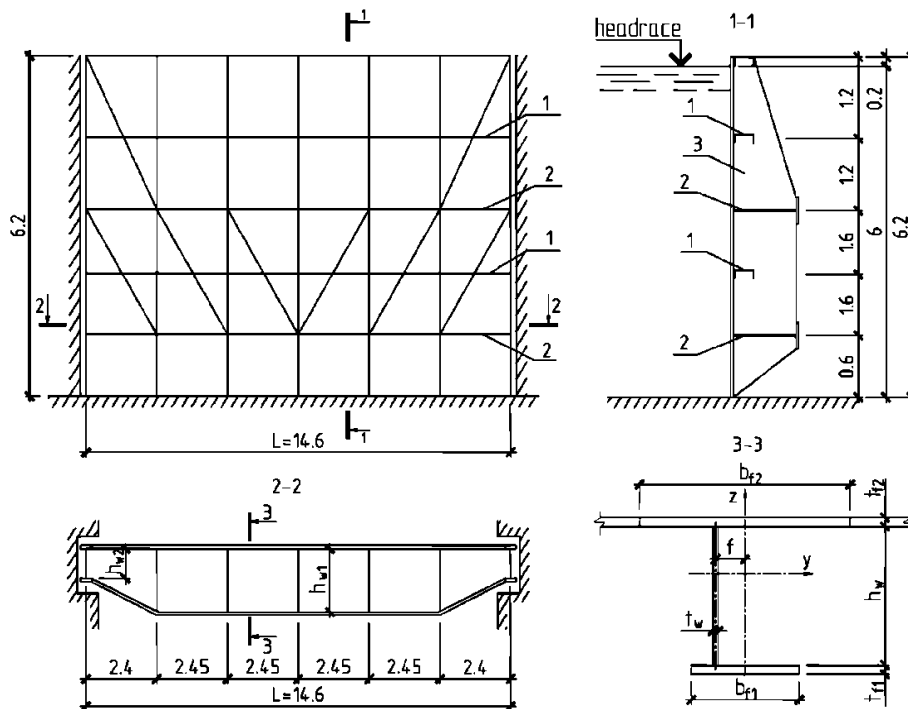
Plain gates sizes and cross-bar design section: 1 – lengthwise beam, 2 – cross-bar, 3 – diaphragm plate.
